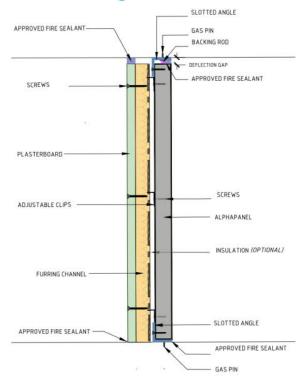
AlphaPanel wall for -/90/90 applications – minimum 35 mm thick AlphaPanel with minimum 16 mm fire rated plasterboard (minimum wall thickness 96 mm)
